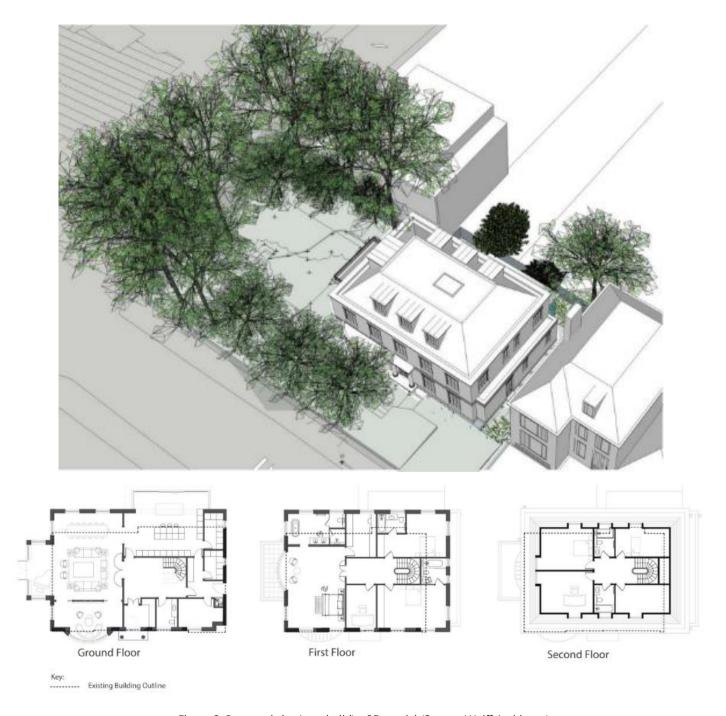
Proposed site (new build) - 3D model (Source: Wolff Architects)
